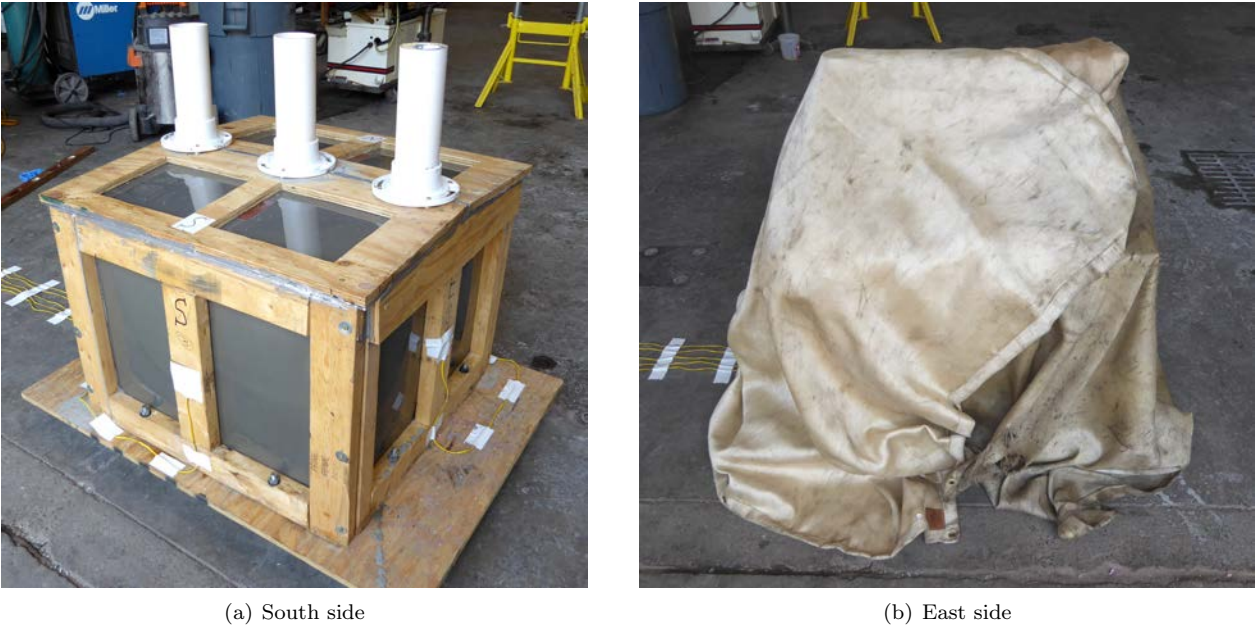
Mockup specimen MU9 — after grouting was completed
